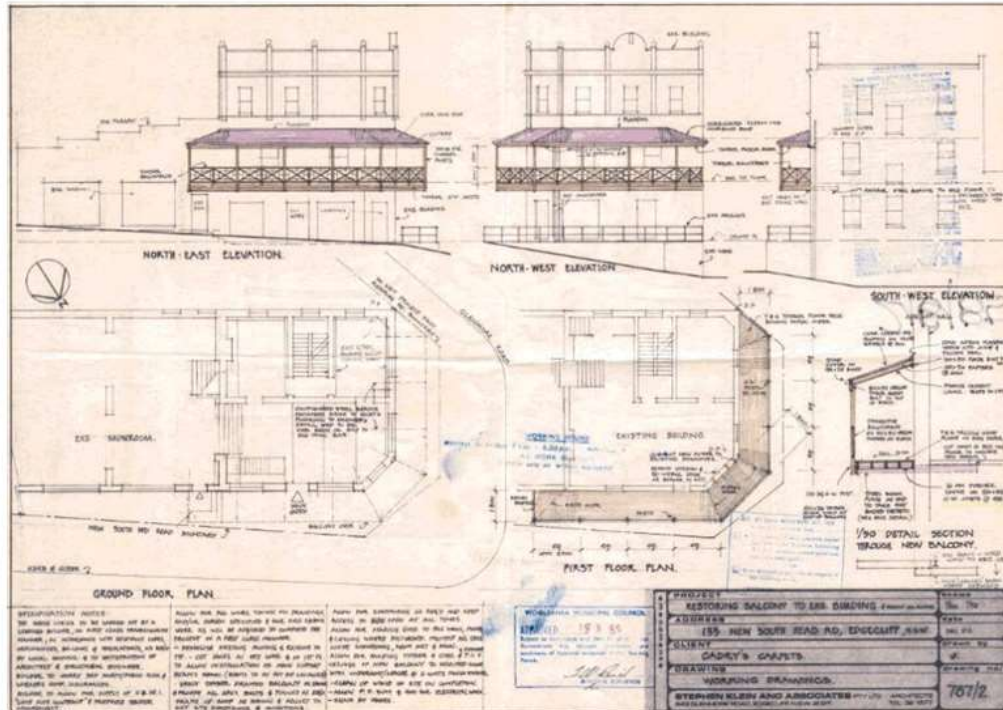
BA1985/218 which approved reinstatement of the first floor level cantilevered balcony. Architect: Stephen Klein and Associates. These works were not carried out. (Source: Woollahra Council)
